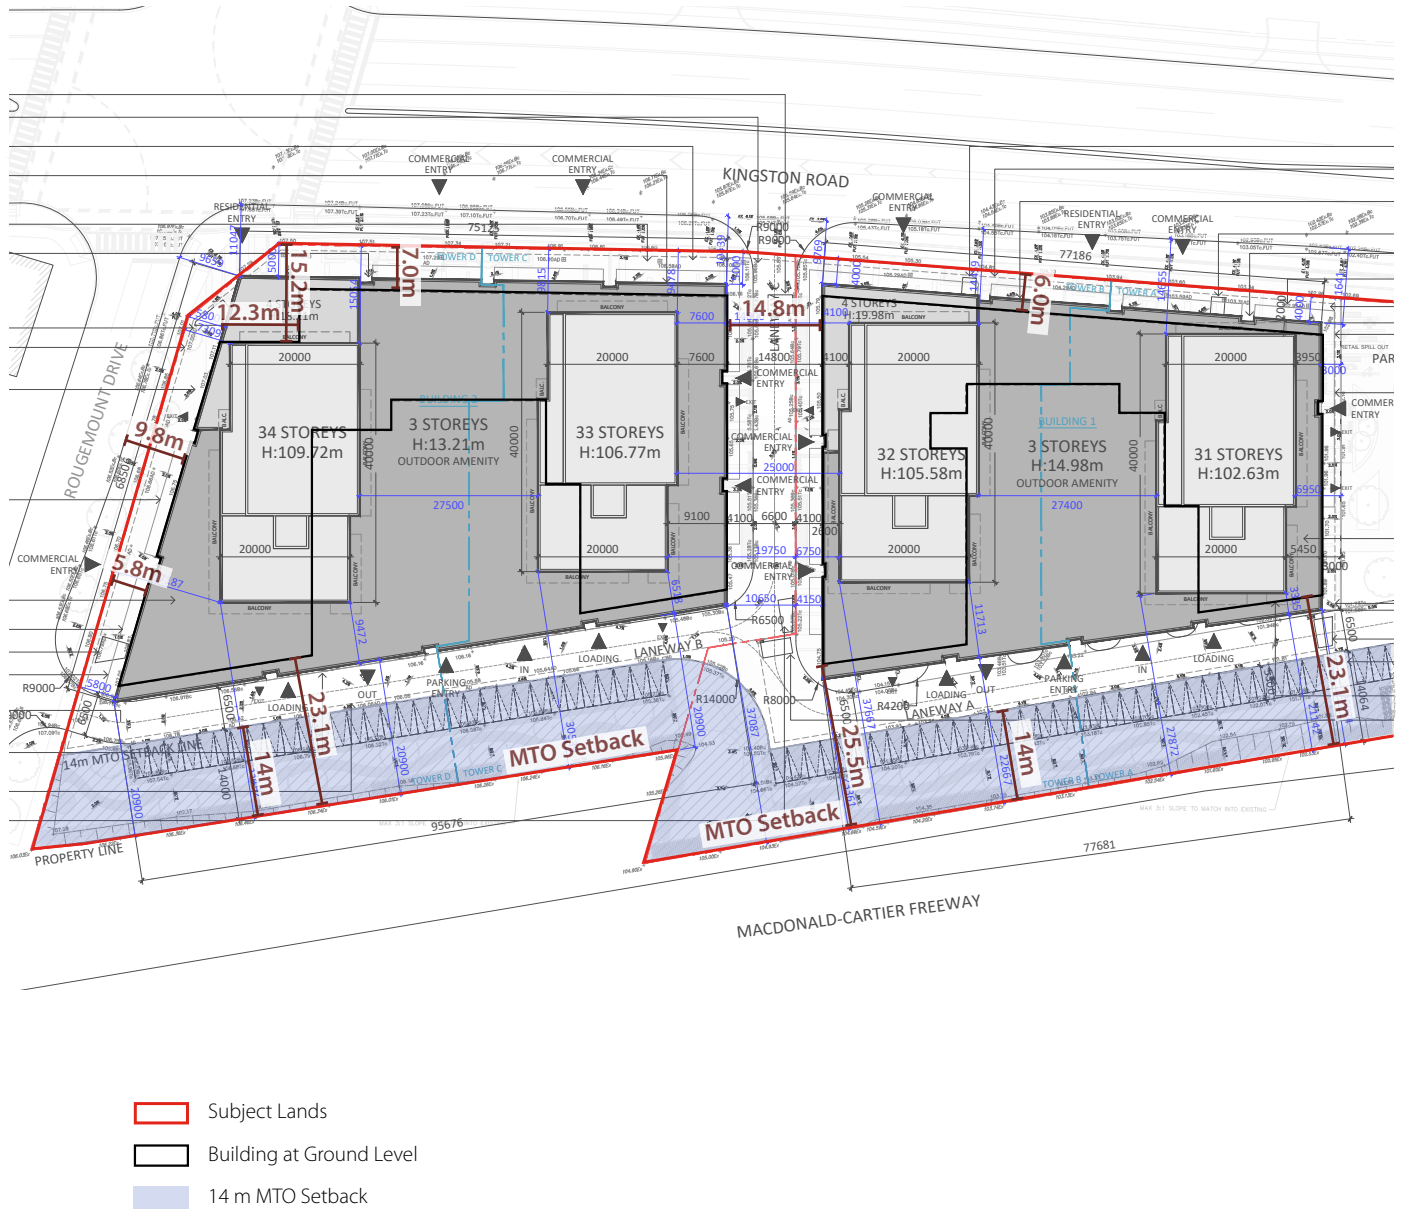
Ground Floor Plan by Studio JCI showing Setbacks and Stepbacks - overlays by MHBC
